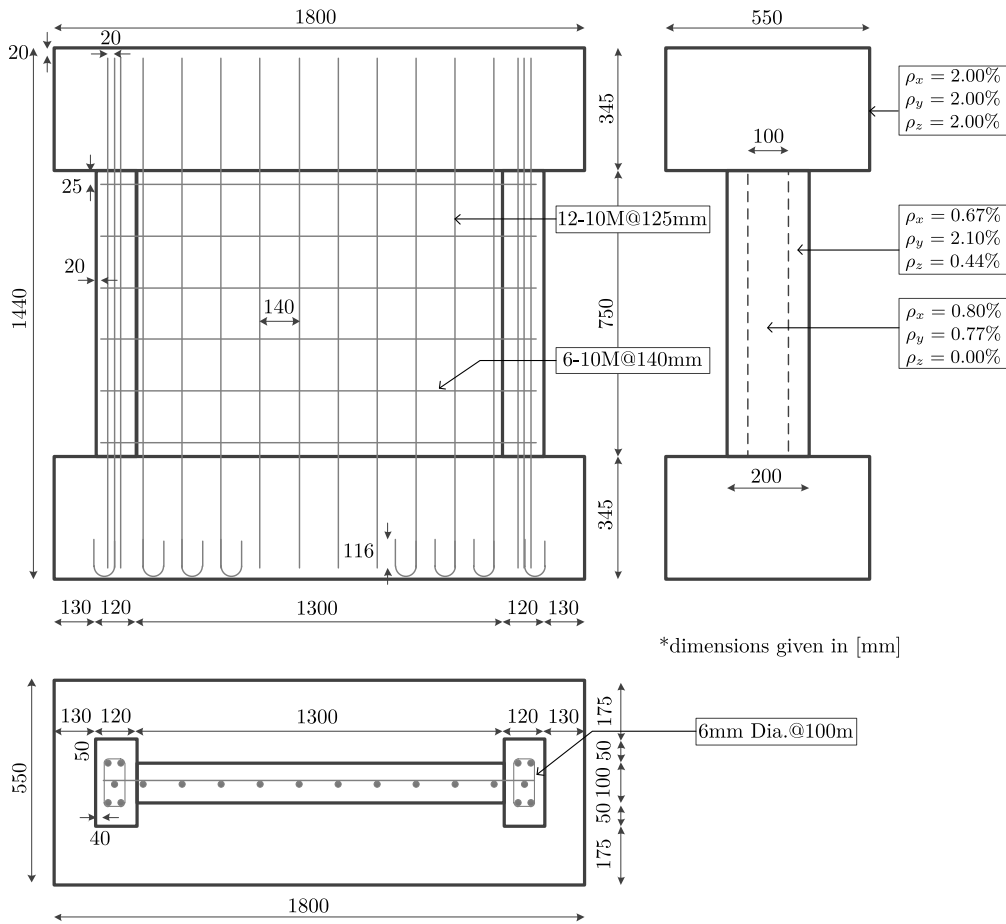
Schematics for the rebar plan of the shear wall model.
